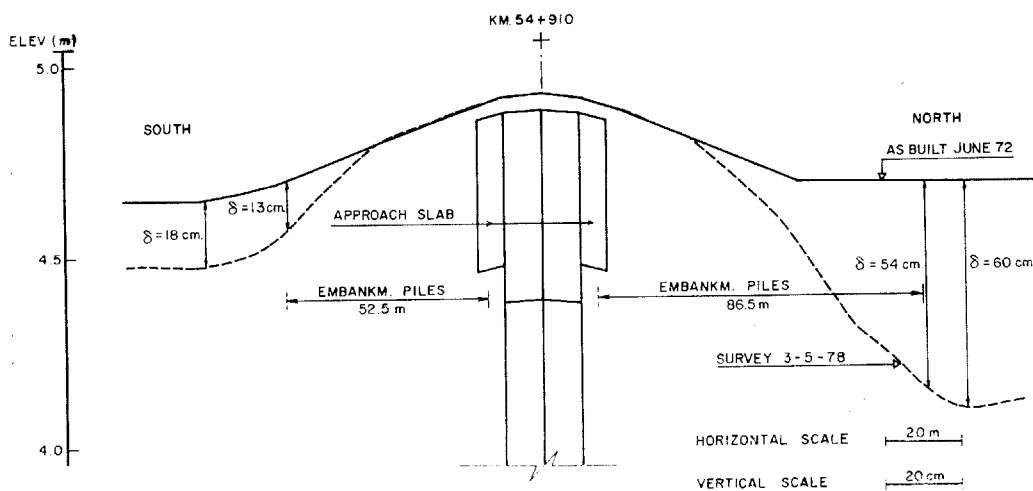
Bridge at km 54 + 910; settlement of approaches.
